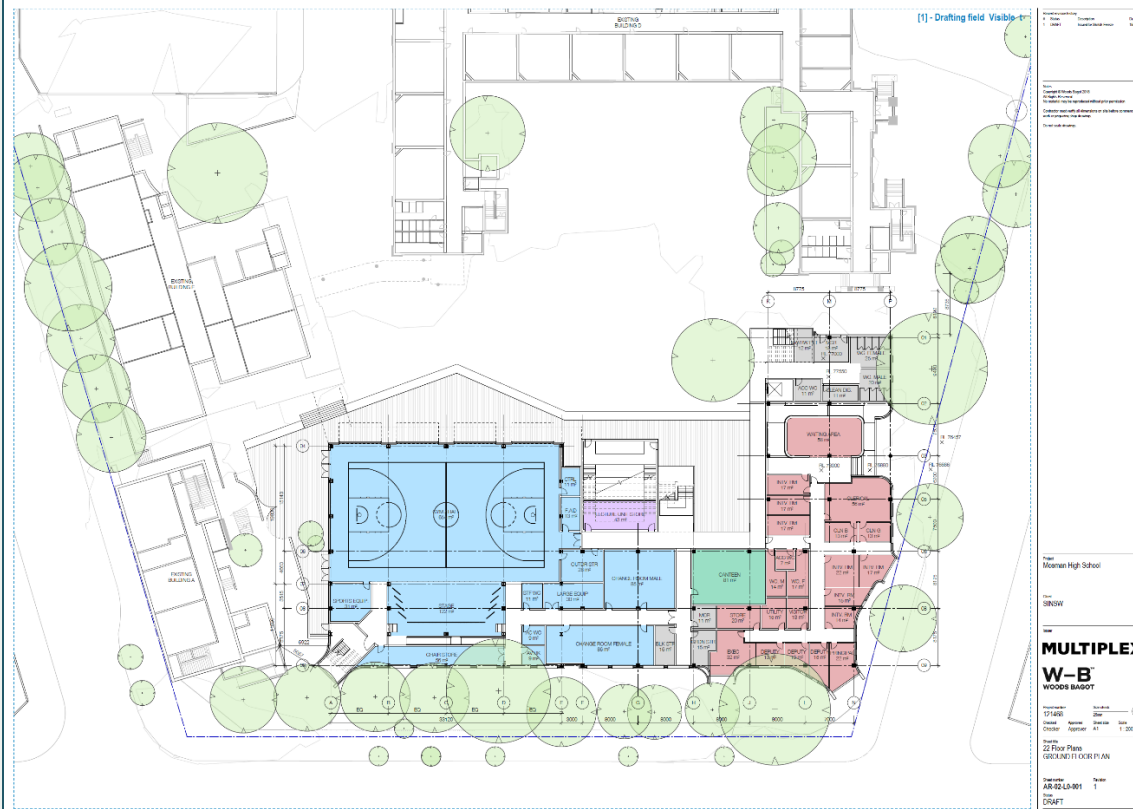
Site plan and proposed scope of works (Woods Bagot, February 2021)
